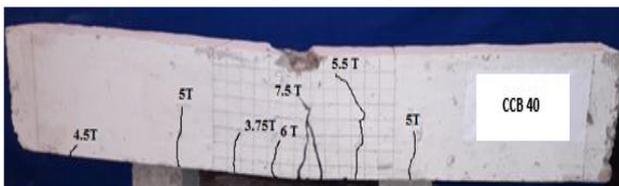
Failure Pattern of Concrete Beam M 40 (CCB)
